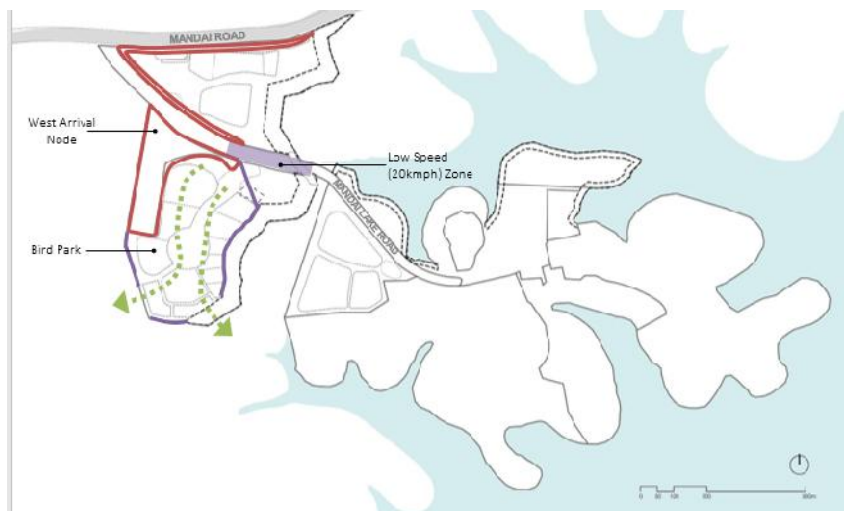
By mid-1Q2017, wildlife shepherding from the Bird Park site is expected to be completed and hoarding shall be installed at the south-east and south-west corners thereby enclosing and preventing re-entry of target fauna into the site. Construction of the Bird Park will commence in end-1Q2017 and is expected to take until 2Q2020.
